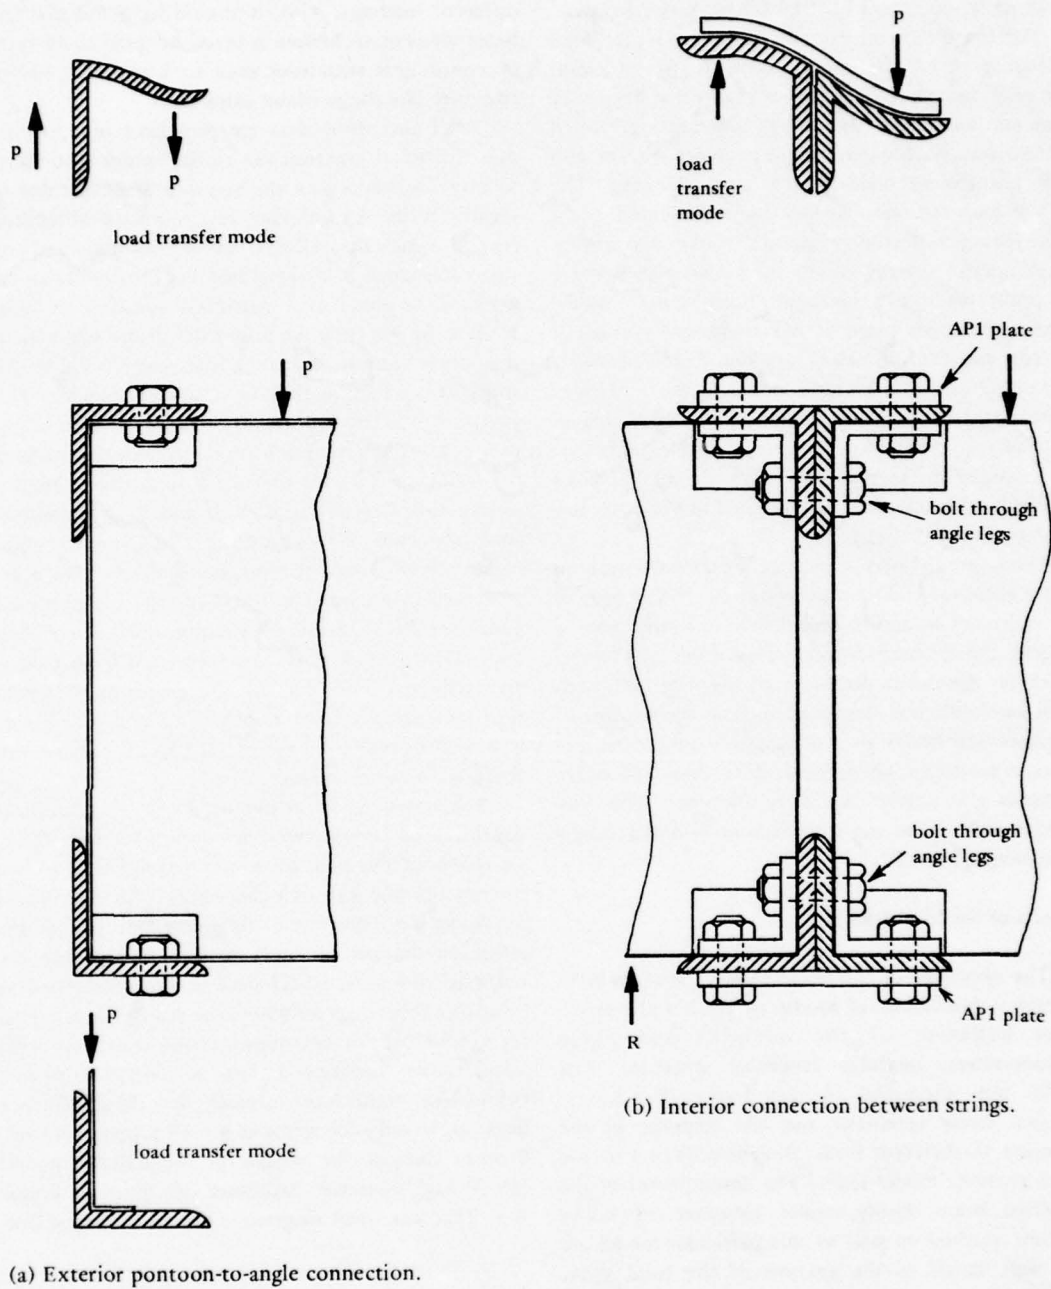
Exterior and interior connections between pontoons and angles and pontoon strings.
